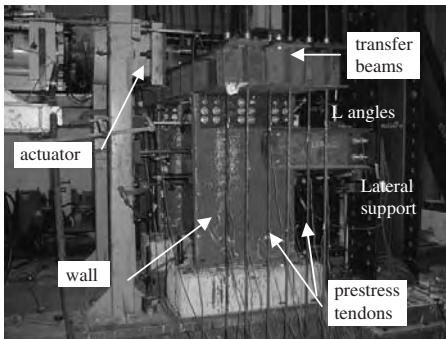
Load test on I-shaped wall retrofitted with glass FRP system.
